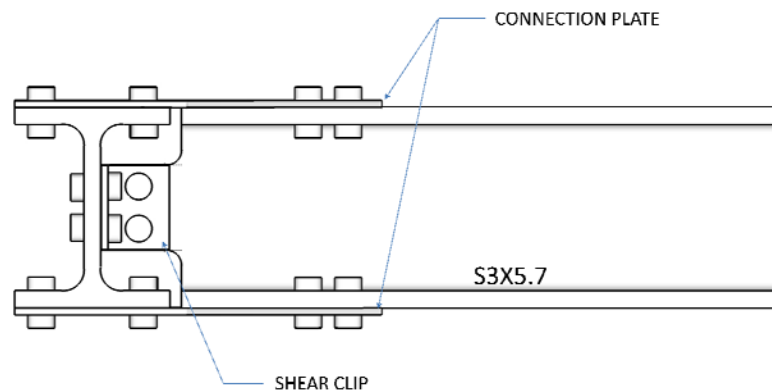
Typical Moment Connection of the Benchmark Structure
